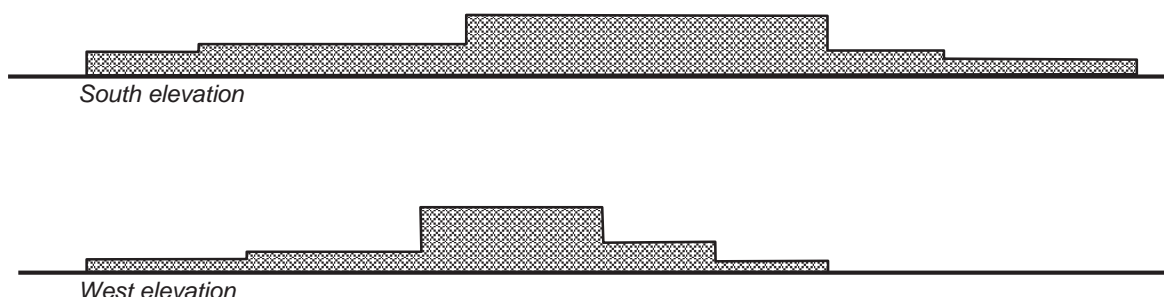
South and West elevations of the ODP envelope. The north and east elevations will be the same, but reversed.
